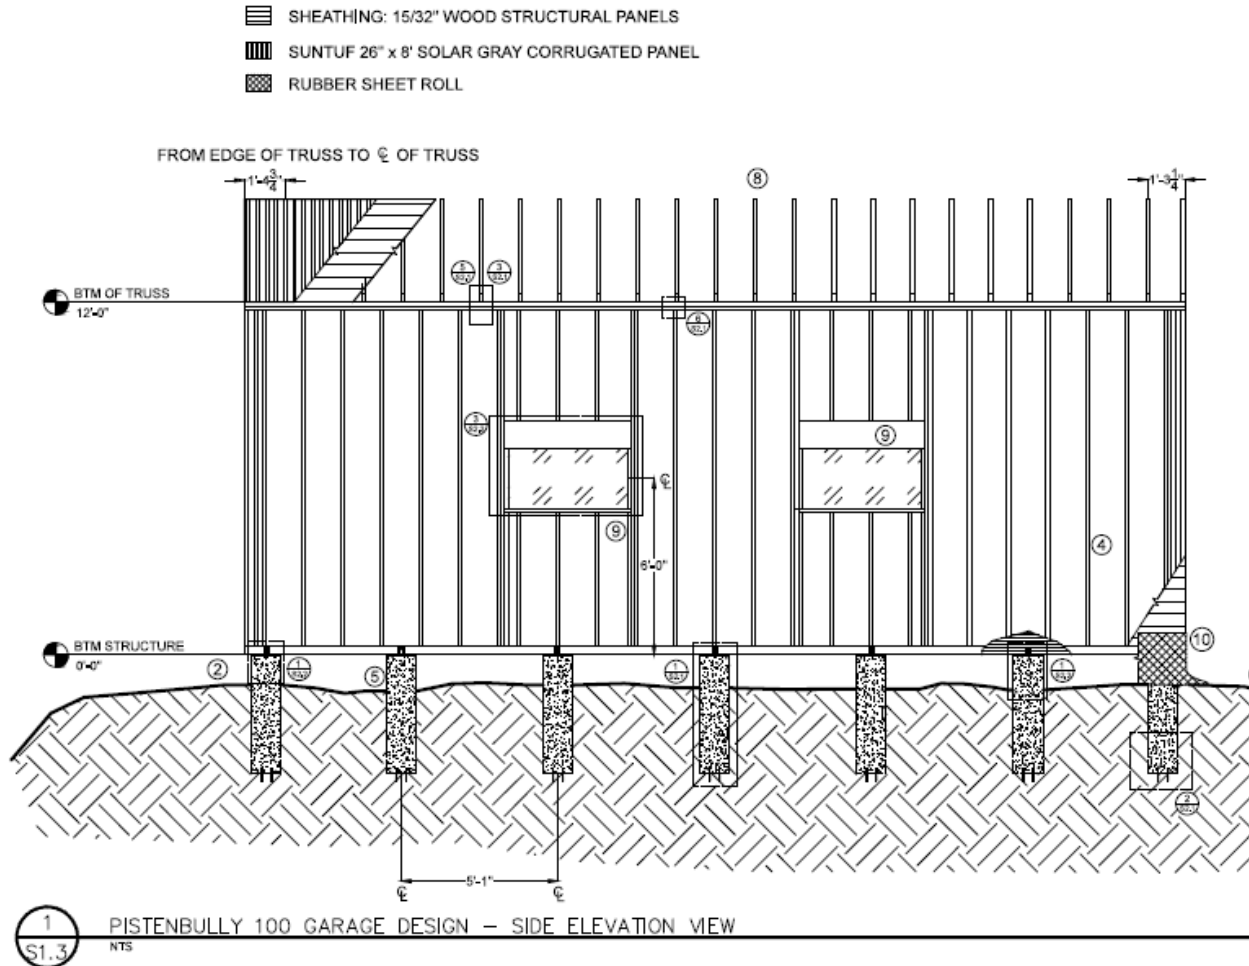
Side elevation view of the structure showing dimensions of walls and openings.
